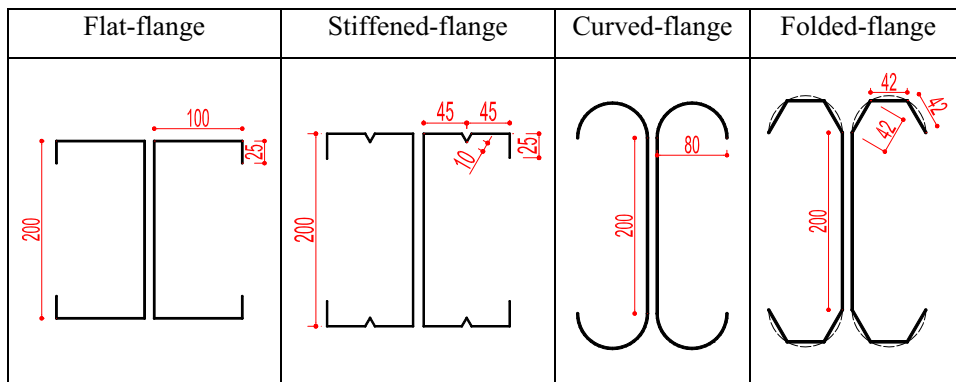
Details of the back-to-back beam cross-sectional dimensions (in mm), $L = 2000$ mm.
